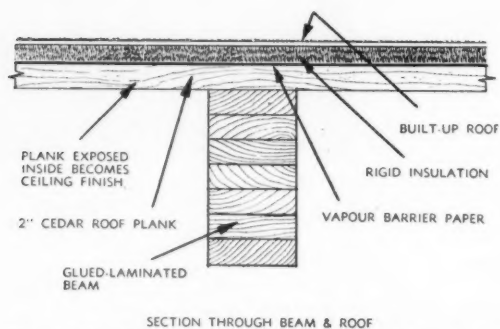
Detail showing use of solid plank deck roofing and ceiling.
